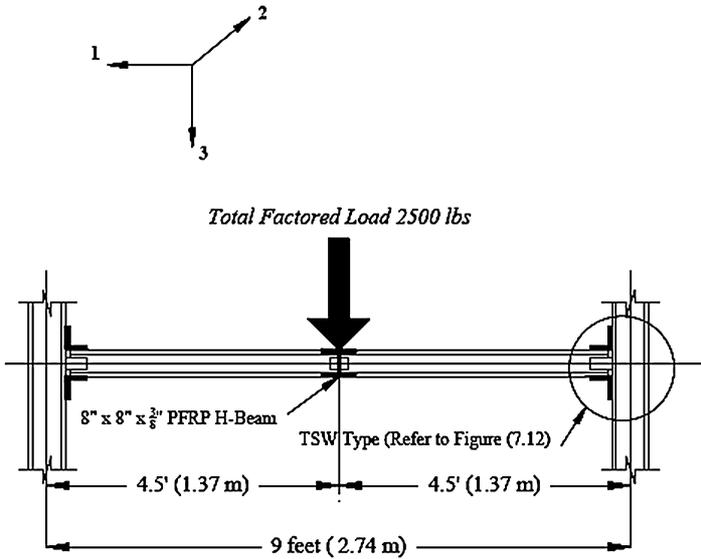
Details of the semi-rigid connected PFRP beam of Example 8-1.
